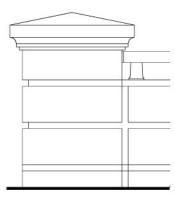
Standard Pathways Concrete Column - Section
